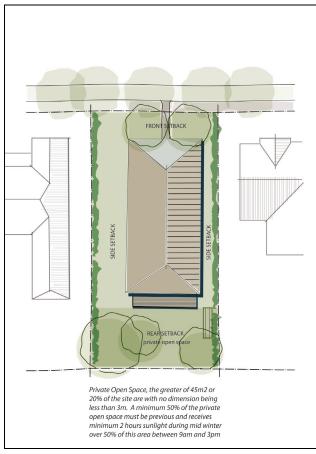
The location of private open space for a dwelling house, attached dwelling house or a semi-attached dwelling house
